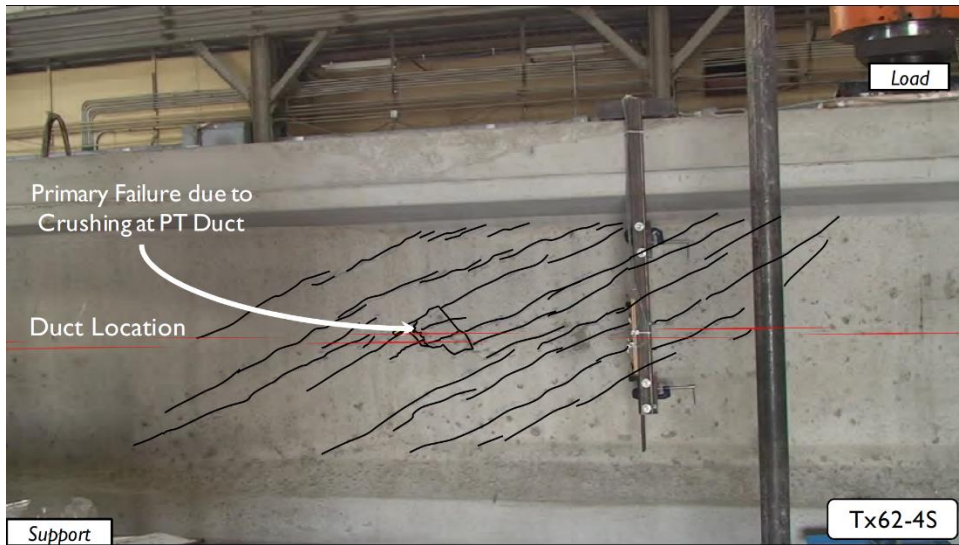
shows that the failure mode for both grouted and ungrouted specimens at ultimate capacity was web crushing at the duct. The duct and full-depth cracks that formed during service level loads would lengthen and widen until concrete near the duct location crushed at the peak shear force. Although the presence and size of ducts influenced the peak shear force for the shear tests, web crushing failure mode was consistent for specimens containing a duct.
